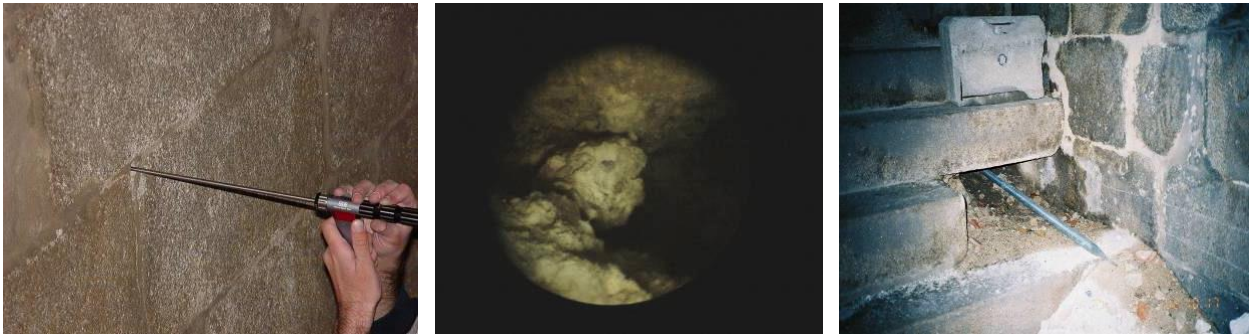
Visual inspection with boroscopic camera and inspection openings.
